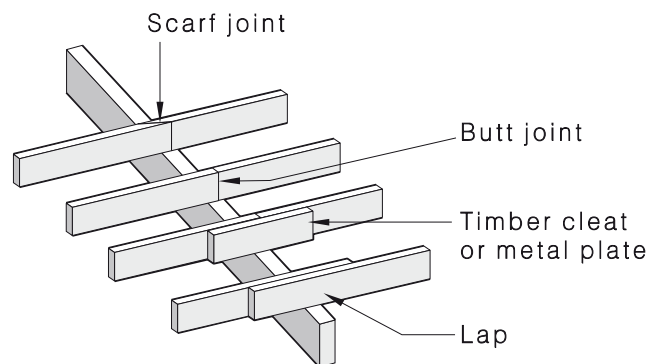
TYPICAL METHODS OF JOINING JOISTS
